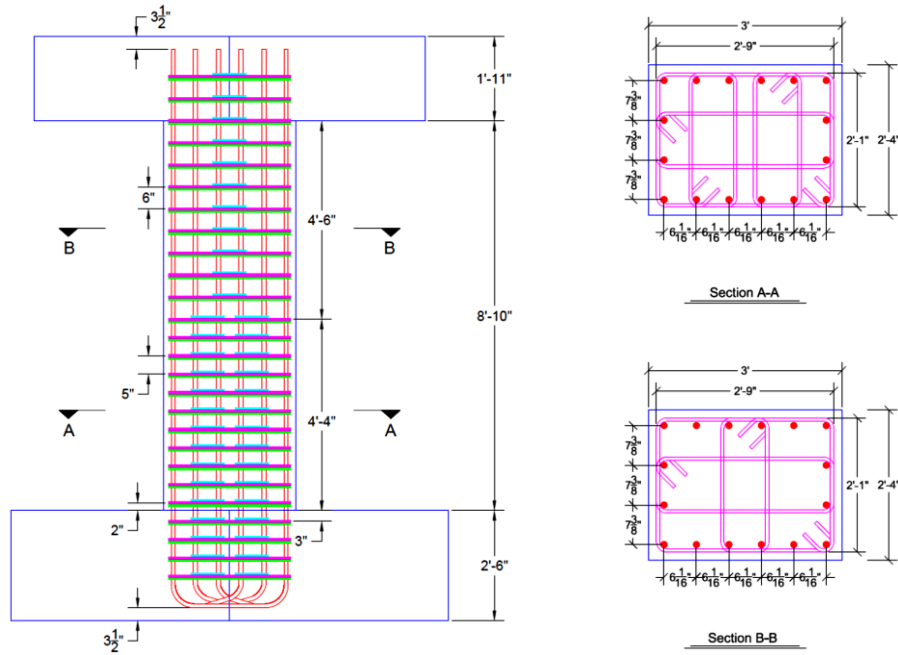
Column details and dimensions (Nojavan et al., 2015)
